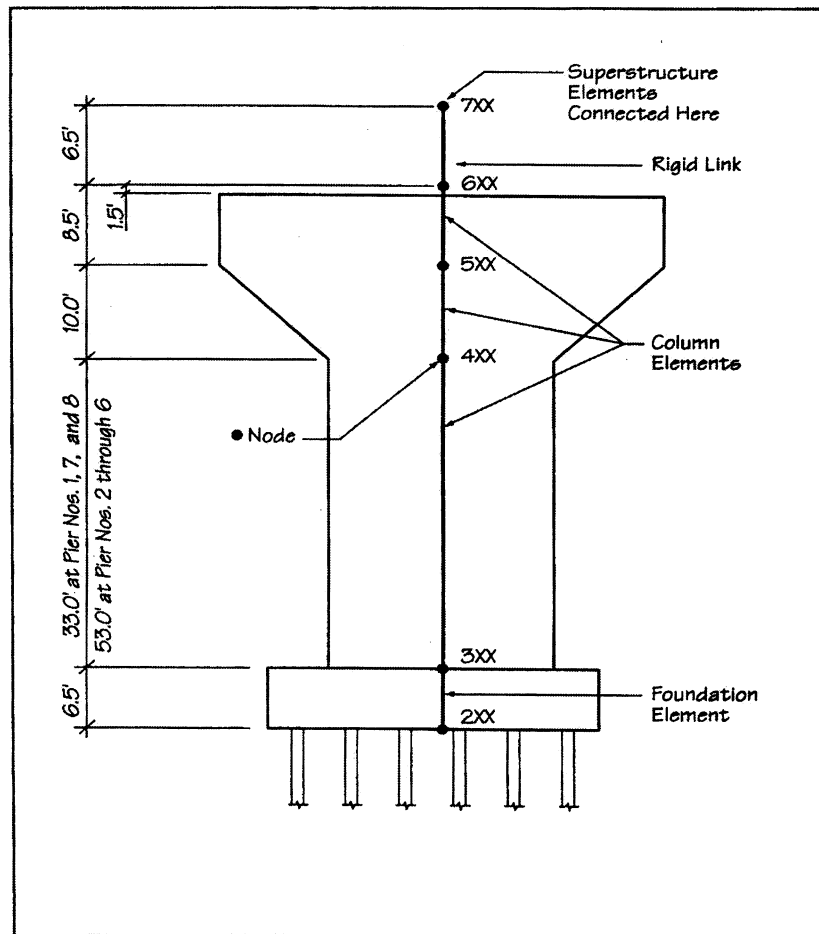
Bridge No. 5 – Details of Pier Column Elements
